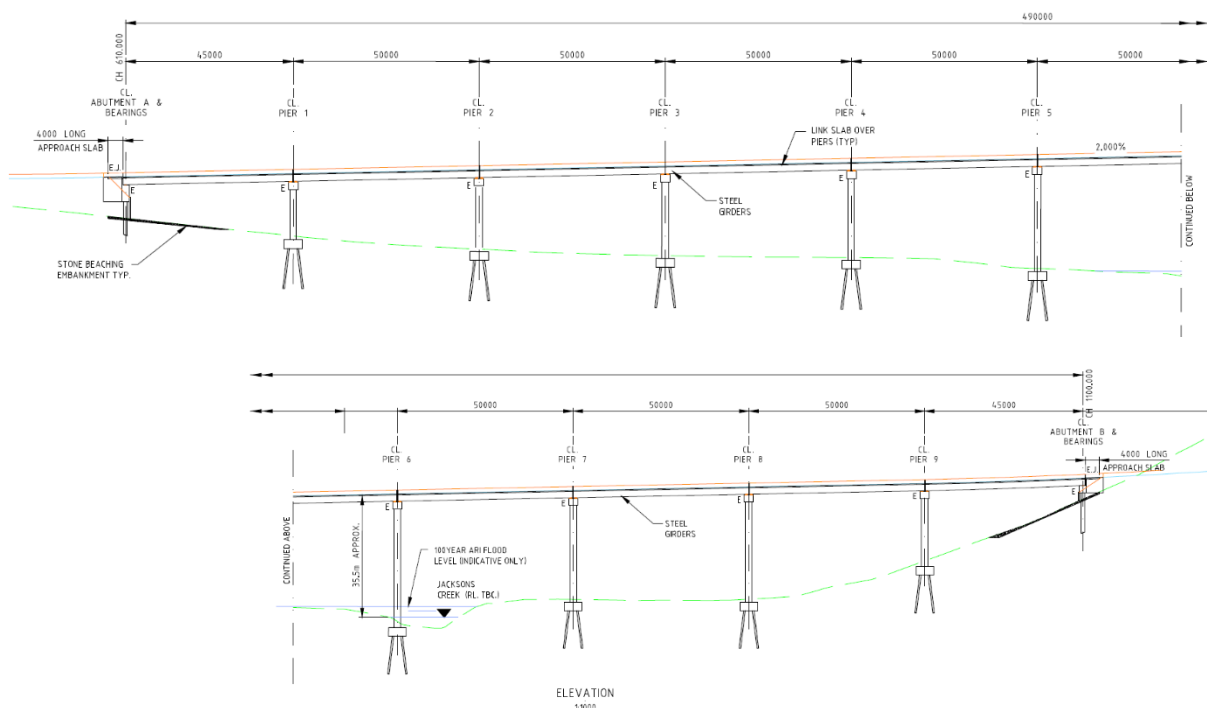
Jacksons Creek Northern Bridge Crossing – Lancefield Road PSP
